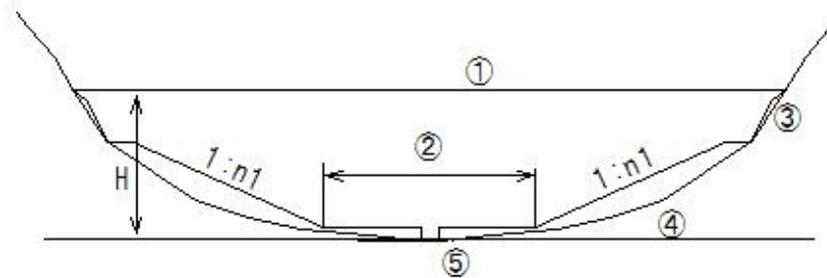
Example 1 of embankment cut-and-cover cross section when excavation affects the ground
